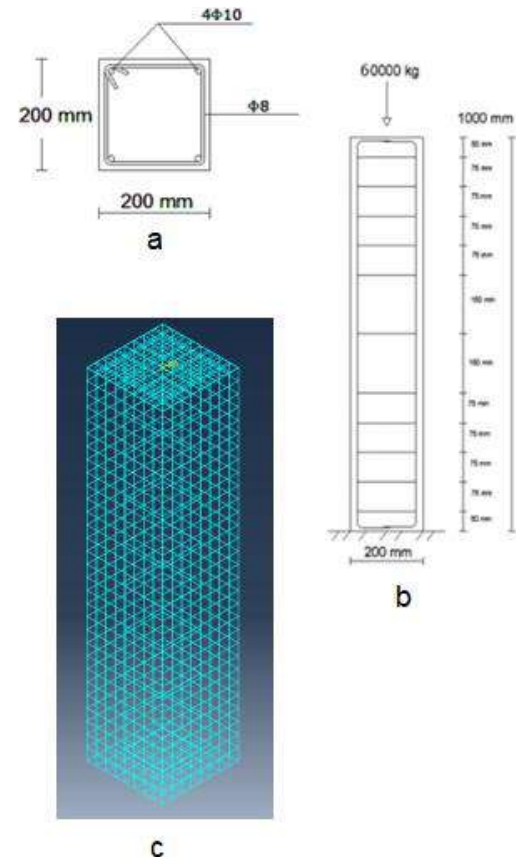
a and b) Schematic of the test system and details of the columns c) Column elementing modeled in Abqus software
